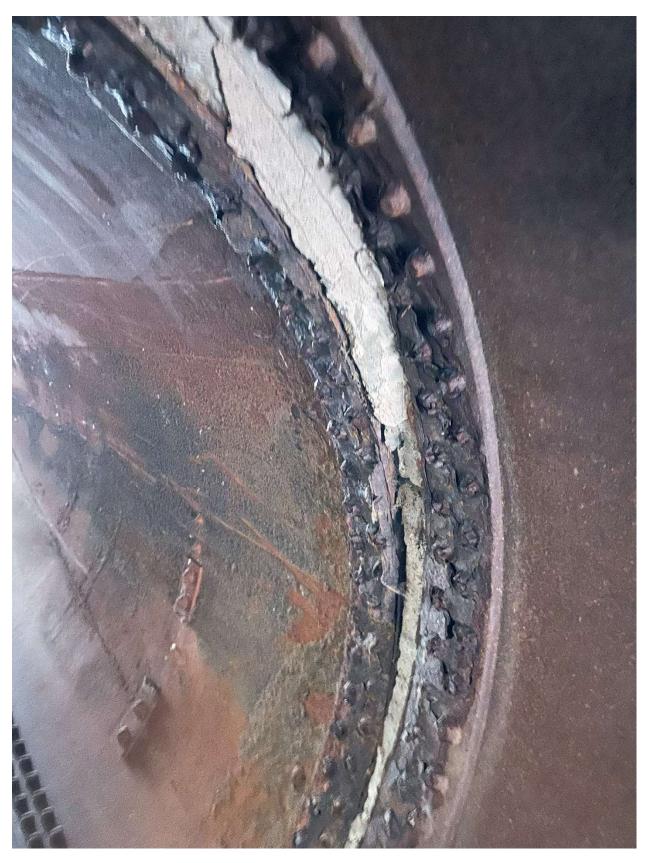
Iradell Road culvert. The rivets on the inside of the culvert are corroded and falling apart.
